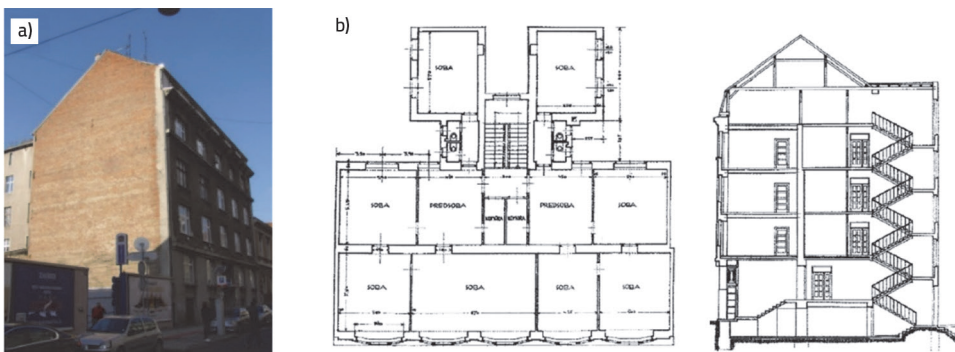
a) Photograph of the building; b) Archive architectural drawings.
